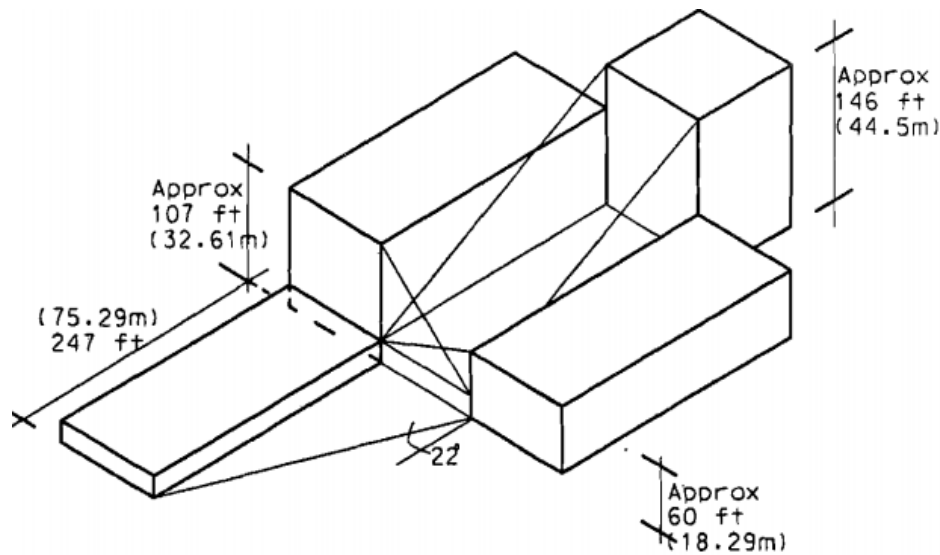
Total shadow construction for a commercial block (cut-off 8am). The north and east are to be covered with tall buildings; the south is to have medium-high buildings; the south-west could be open.
